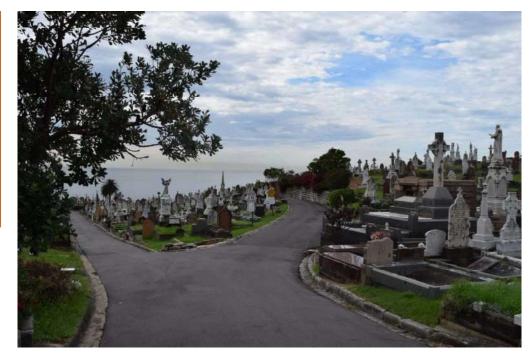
Bitumen roads kerbed and guttered with sandstone and concrete through the site.
